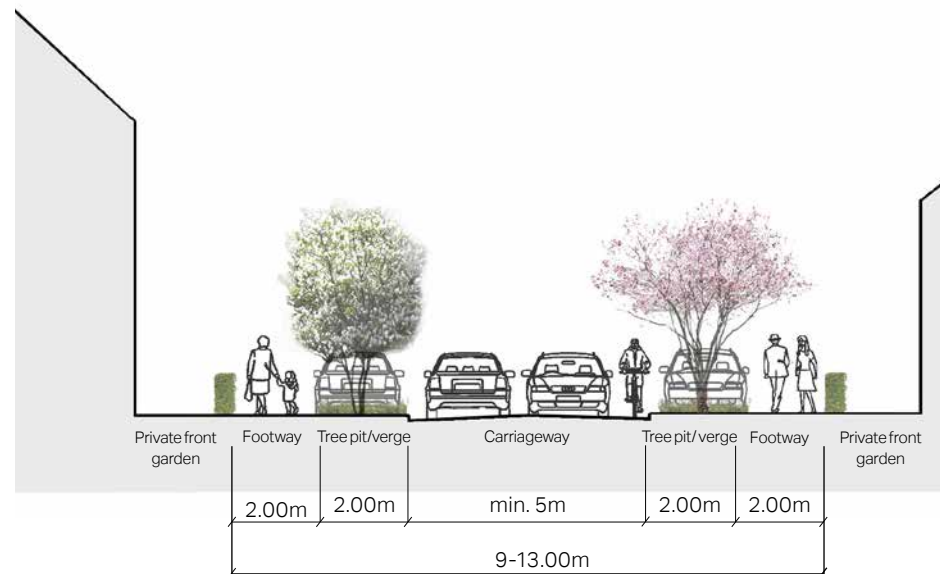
Cross-section to illustrate some dimensions for secondary streets.
